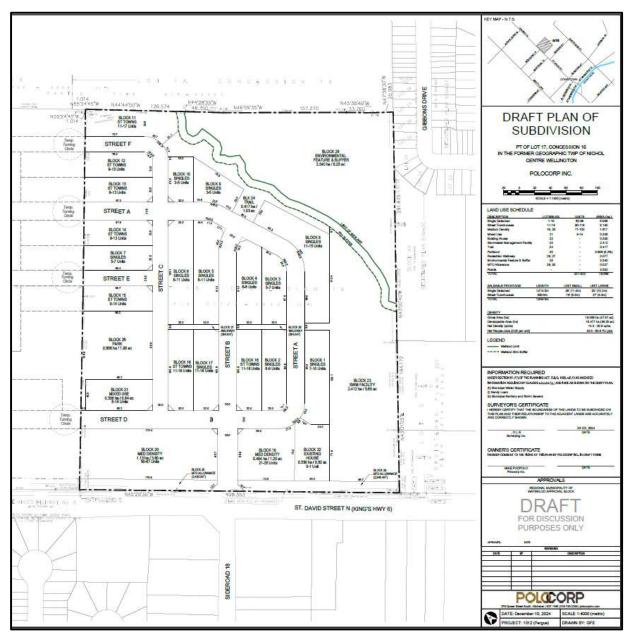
Draft Plan of Subdivision (Source: Polocorp Inc.)
